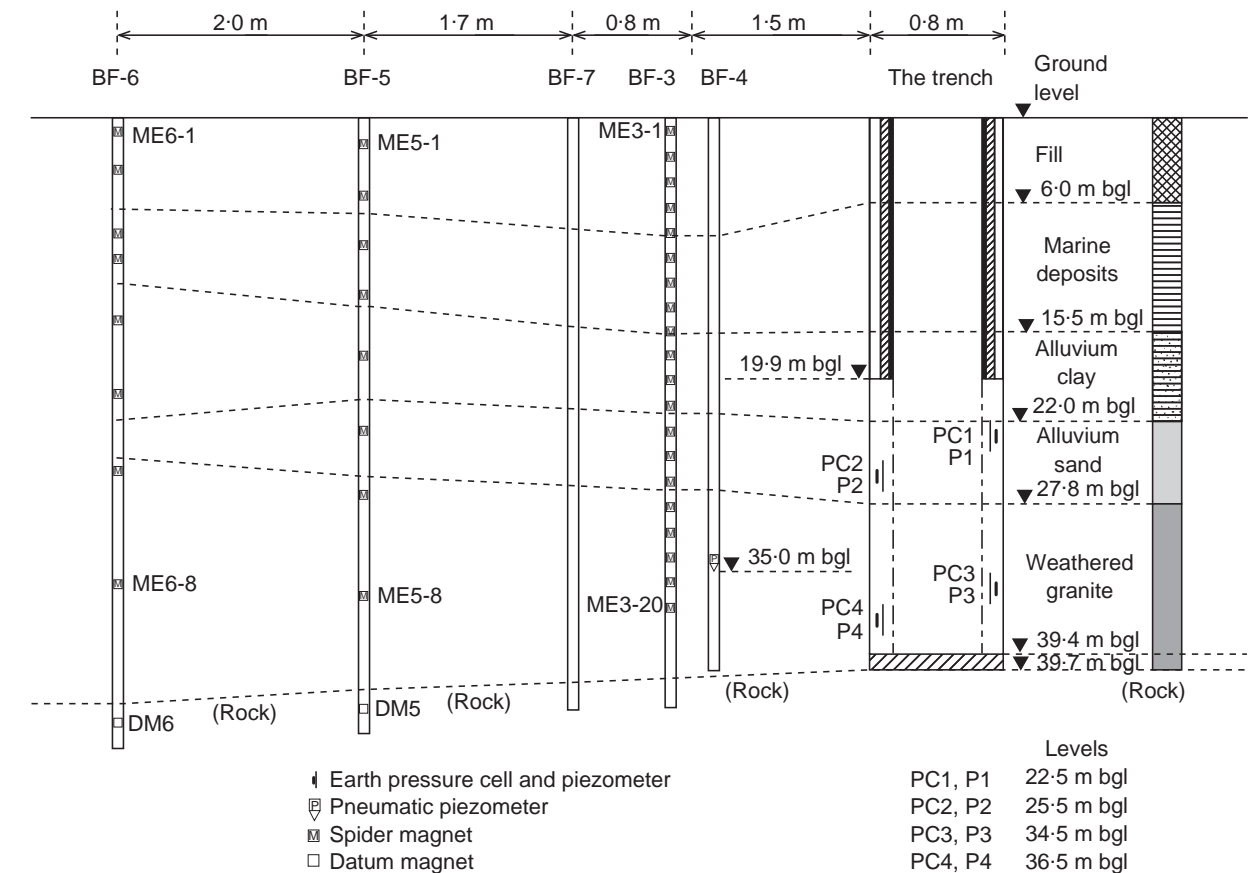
Typical schematic cross-section A-A showing layout of instrumentation (not to scale)
